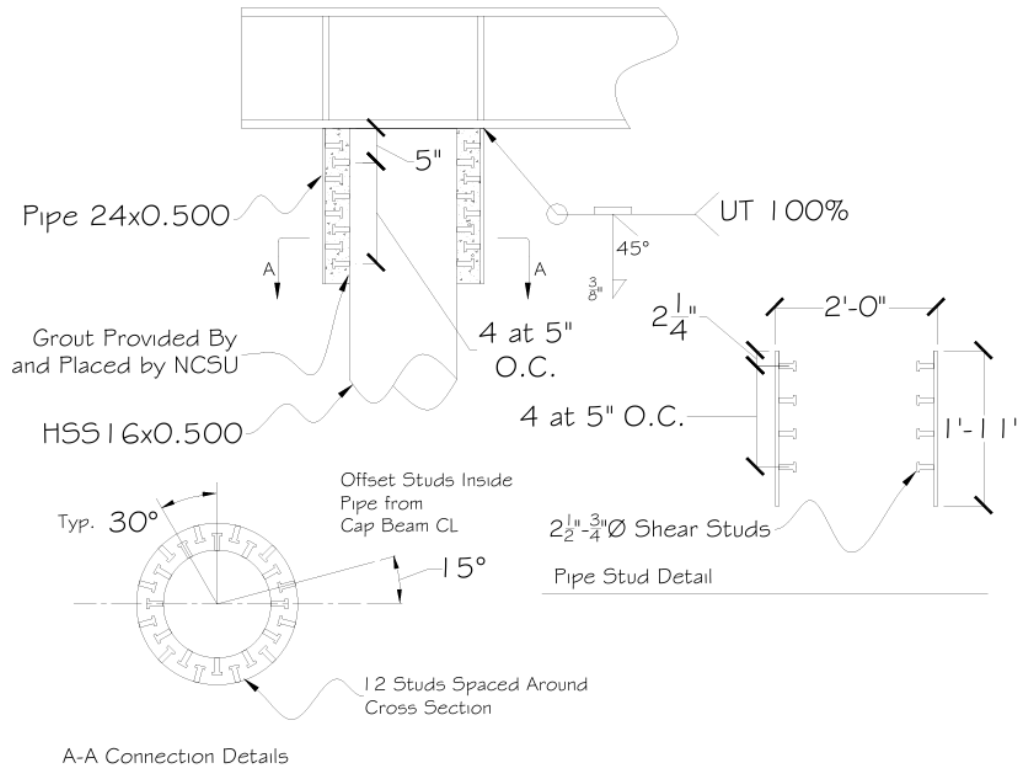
Grouted shear stud connection detail (Fulmer et al., 2013)
